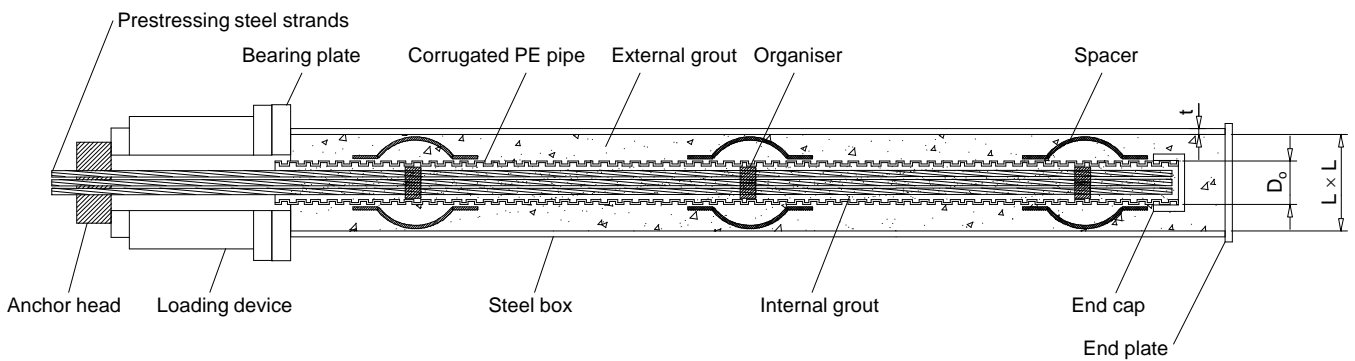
Specimen for EN 1537, Annex A, Test B – Schematic example
